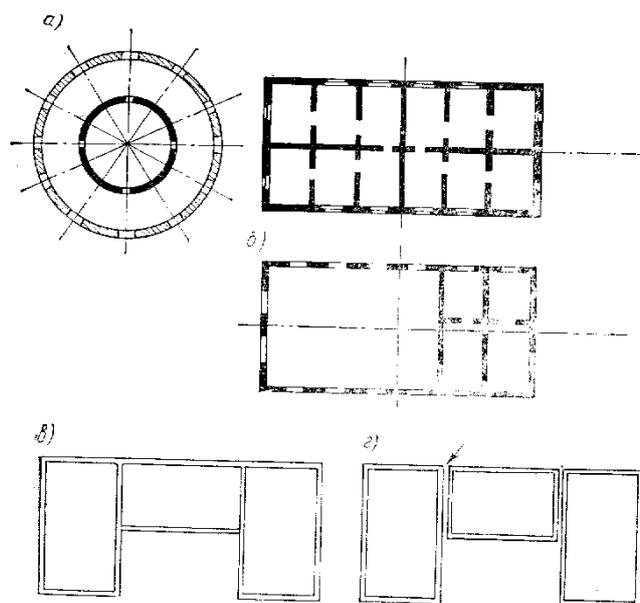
Seismic-resistant buildings plan: α -symmetric building; b -symmetrical building; b, Γ ,- complex shaped building (a -incorrect solution; Γ - correct solution)
